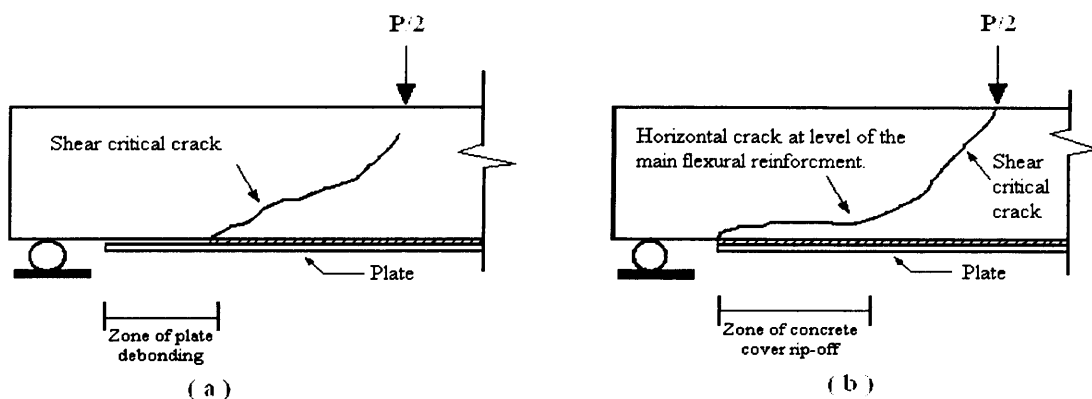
Failure of beams retrofitted with steel plates: (a) by plate de-bonding and (b) by ripping off of the concrete cover (after Ziraba et al. 1994)
